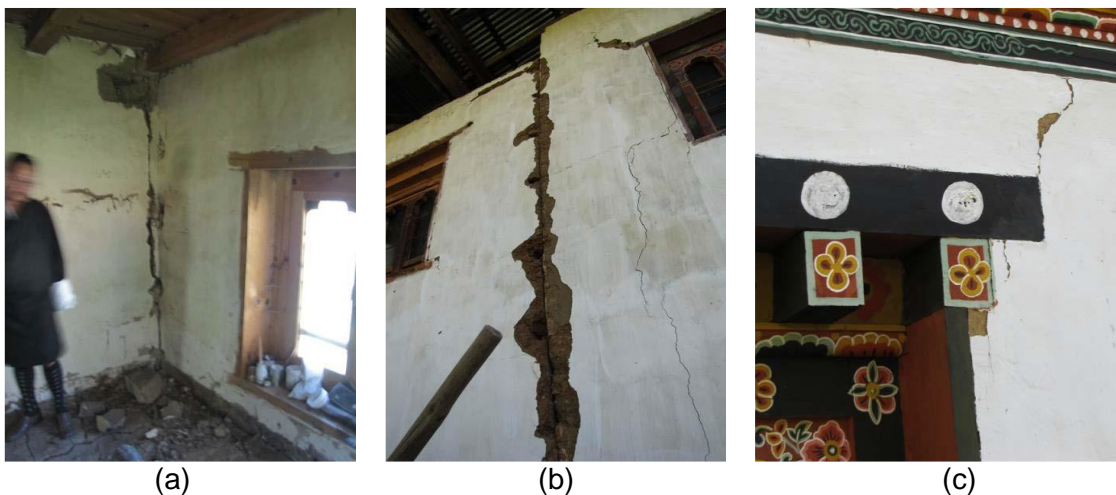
Typical damages of RE constructions from Bhutan, after the Sikkim-Bhutan earthquake: (a) corner cracks; (b) separation of old and new walls; (c) diagonal cracks at the openings
